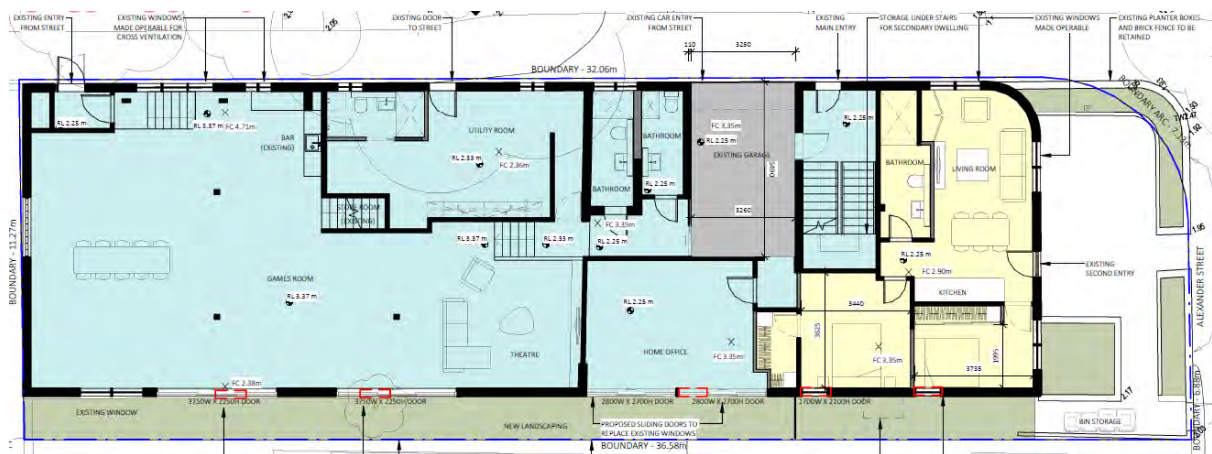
Proposed ground floor floorplan, Dickson Rothschild Architects
